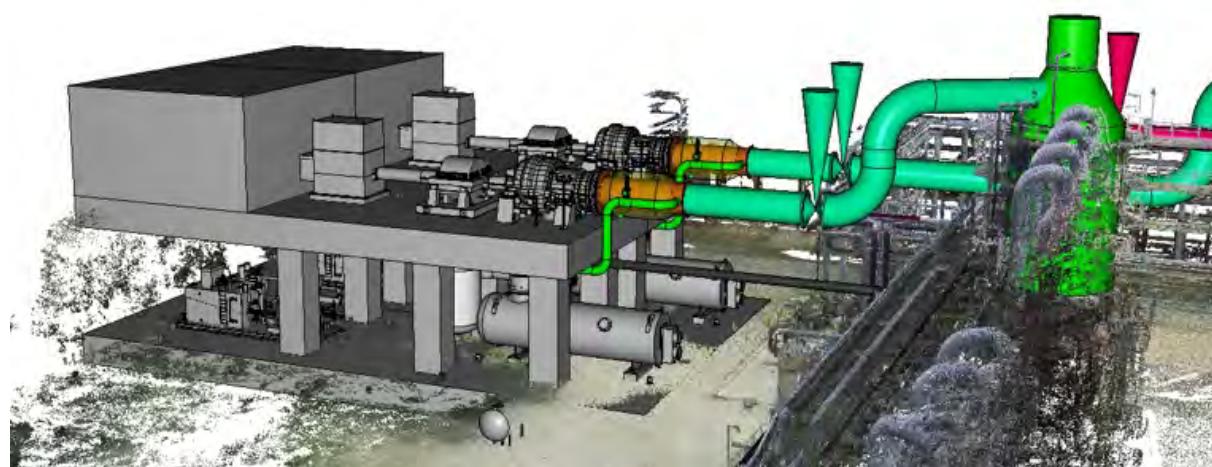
Evaporation compressor layout with one axial flow low pressure duty and one multistage high-pressure duty driven by one motor
